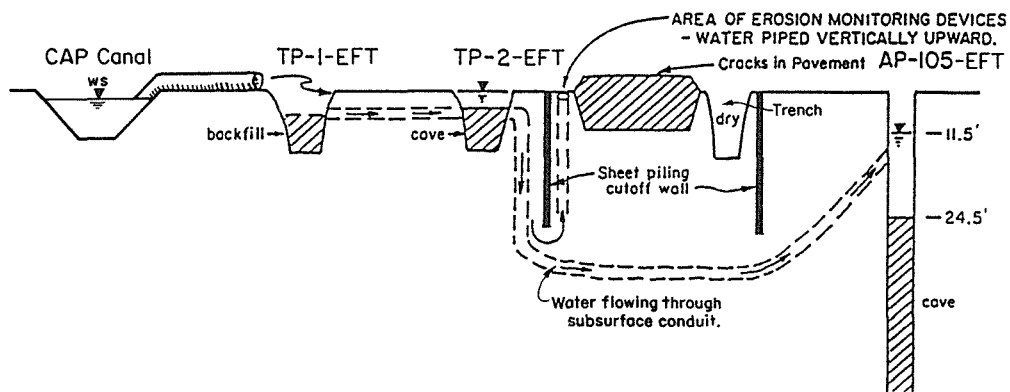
View along an earth fissure trace showing the method of failure induced at a sheet piling cutoff wall intended to mitigate earth fissure development.
